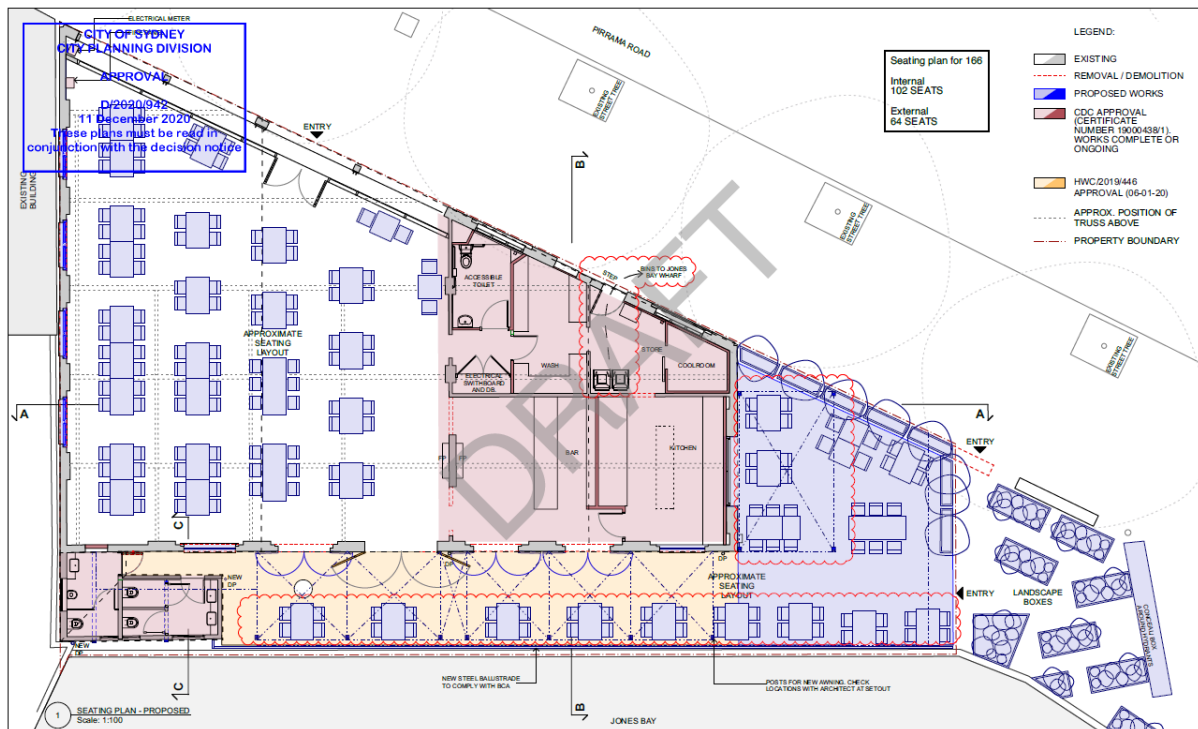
Extract of approved plan granted under D/2020/942, showing the approved indoor and outdoor seating layout
